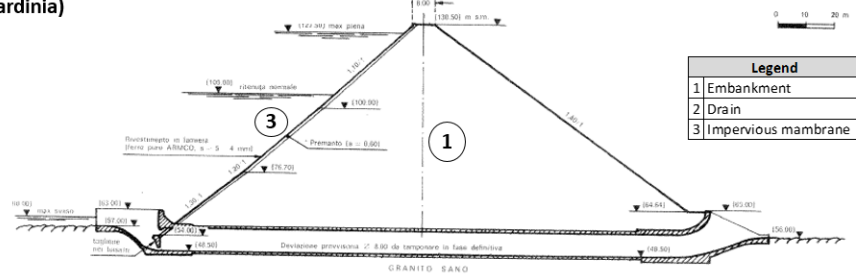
Examples of typical cross section of existing rockfill dam with impervious face in Italy (Jappelli, Pellegrino et Al., 1981)
